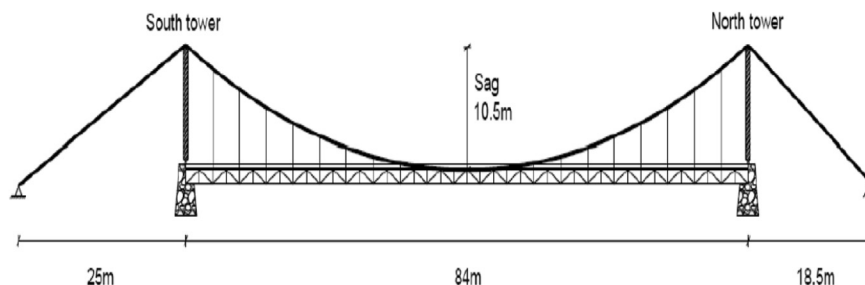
Longitudinal profile of Olfusá bridge [19, 20]
